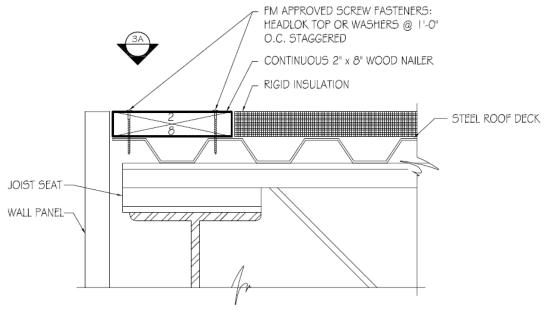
ROOF EDGE WOOD BLOCKING - SCREW FASTENER ANCHORAGE
